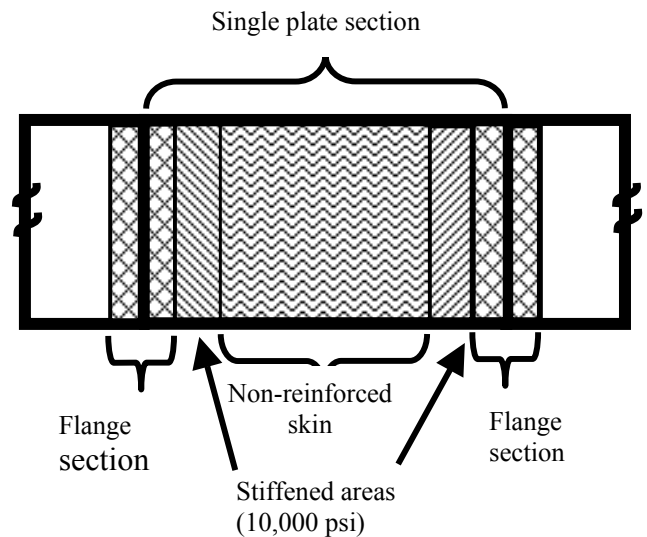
Non-reinforced liner plate is modeled in three sections (flange section, stiffened area, and non-reinforce skin).
